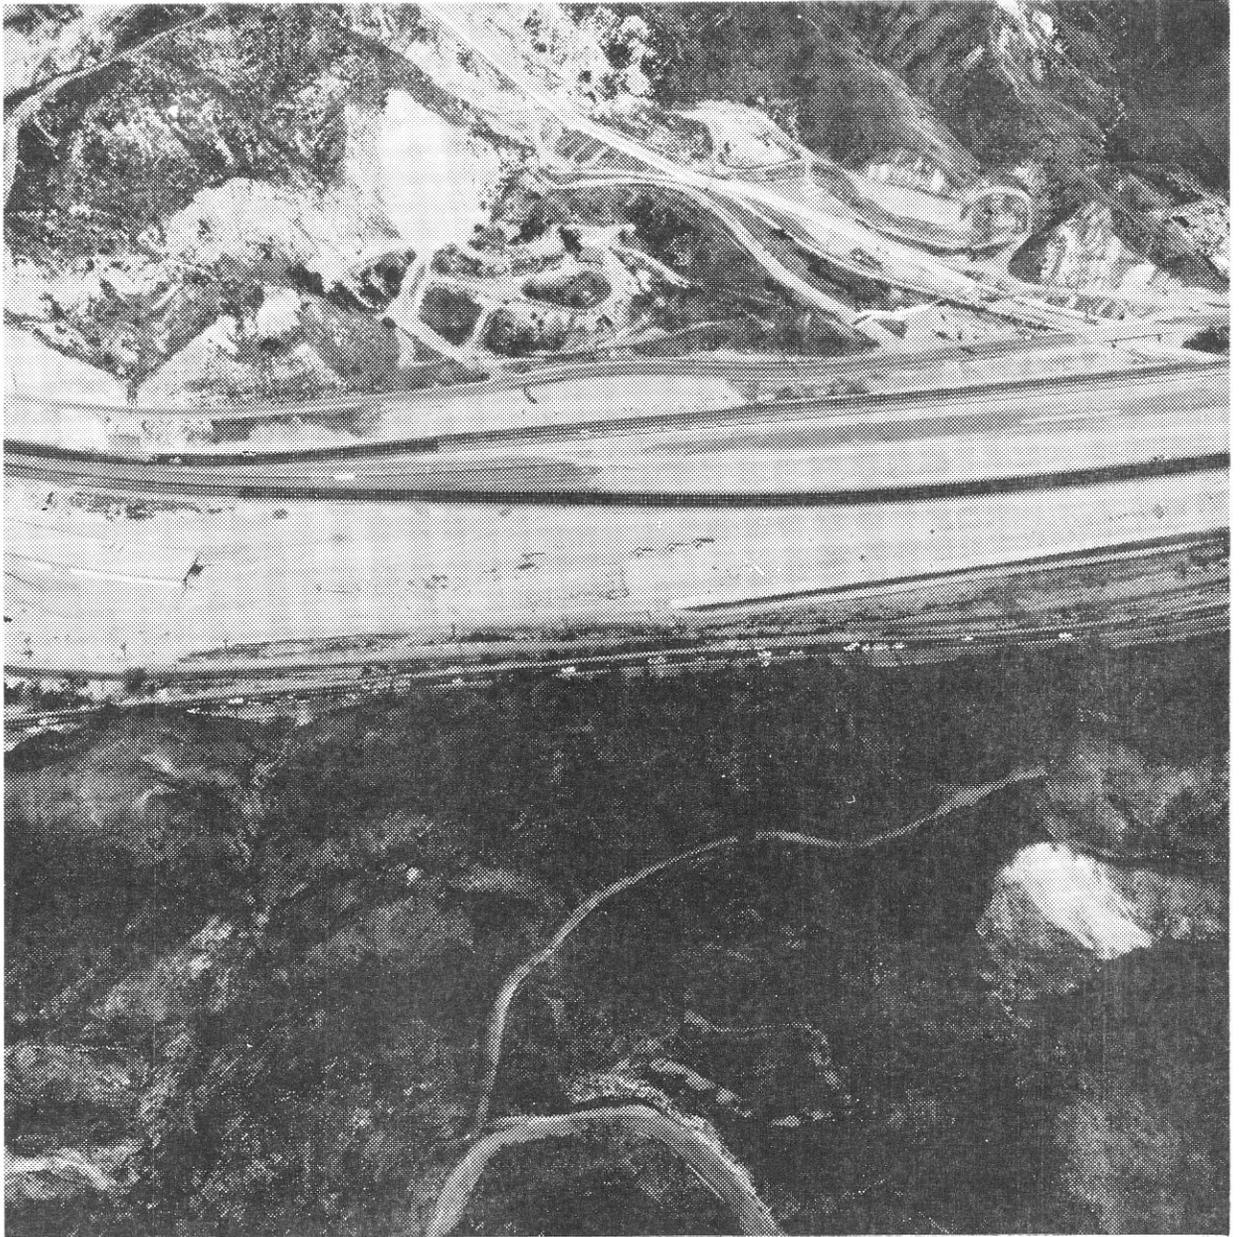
Looking easterly at Route 5 immediately north of Balboa Boulevard Overcrossing.
